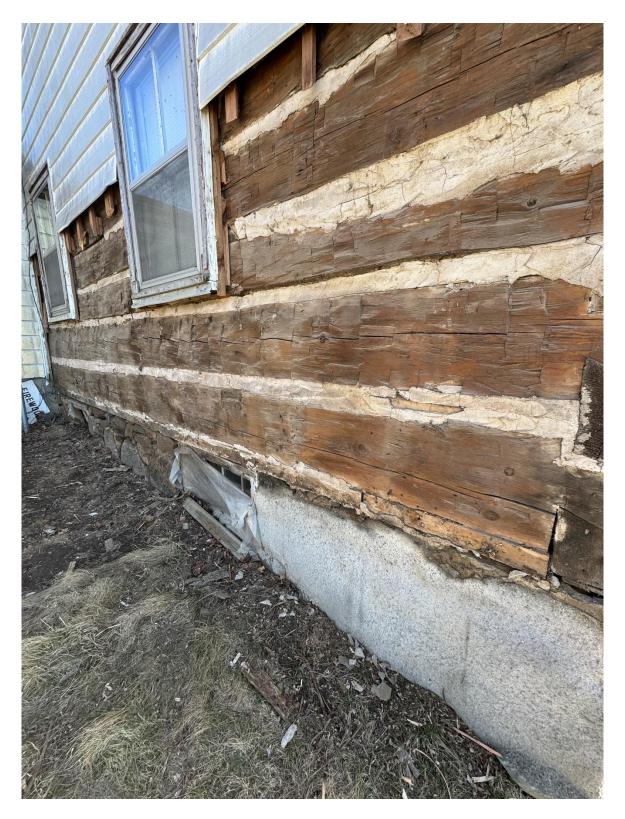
West elevation, partially parged foundation, exposed wall with chinking
